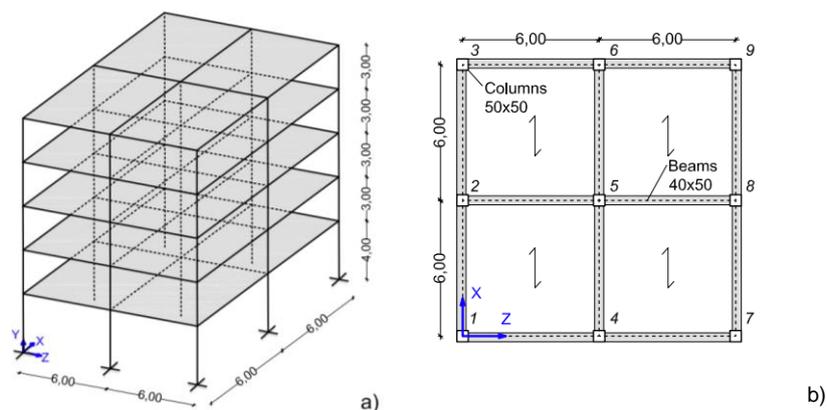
Geometrical dimensions of the case study structures: a) 3D frame view; b) dimensions in plan.
